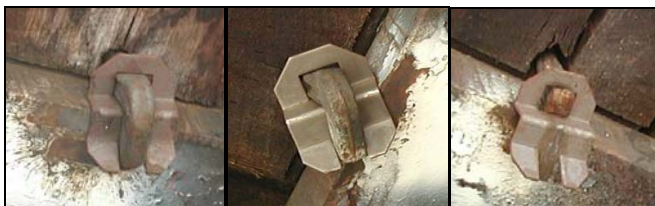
Hook Bolt Fasteners with Locking Clips, (6a) Typical, (6b) Turned Hook Bolt, and (6c) Broken Hook Bolt
